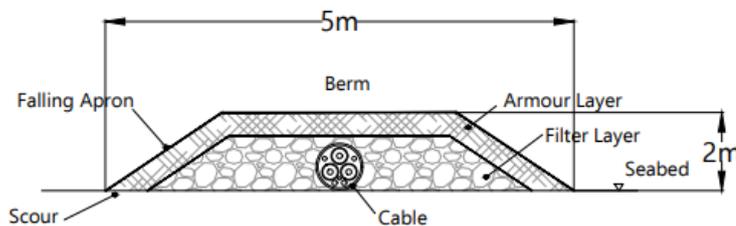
Indicative Inter-Array Cable Cross-Section (Source: CIP)
